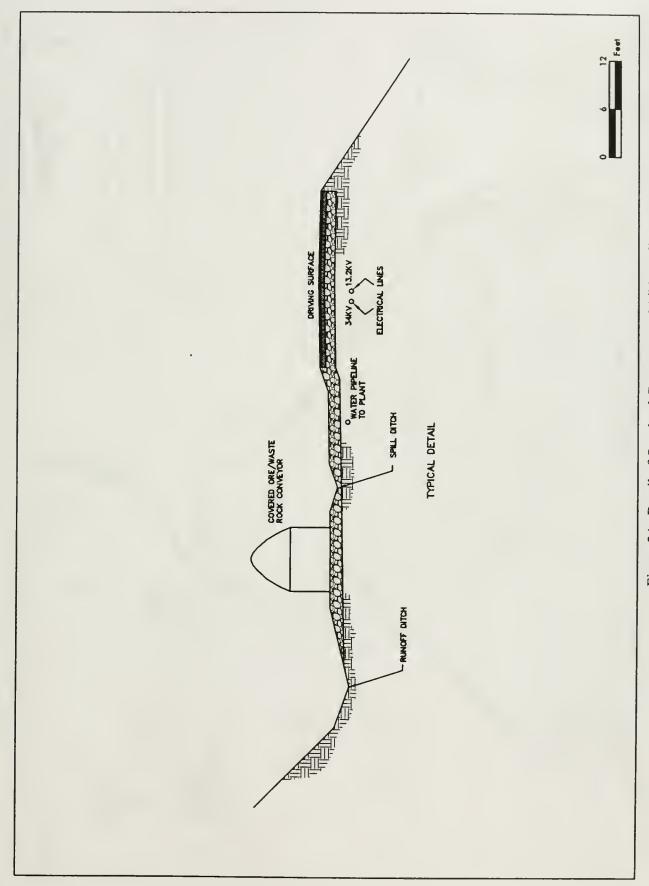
Detail of Overland Conveyor and Libby Adit Access Road, Alternatives 3 and 4
